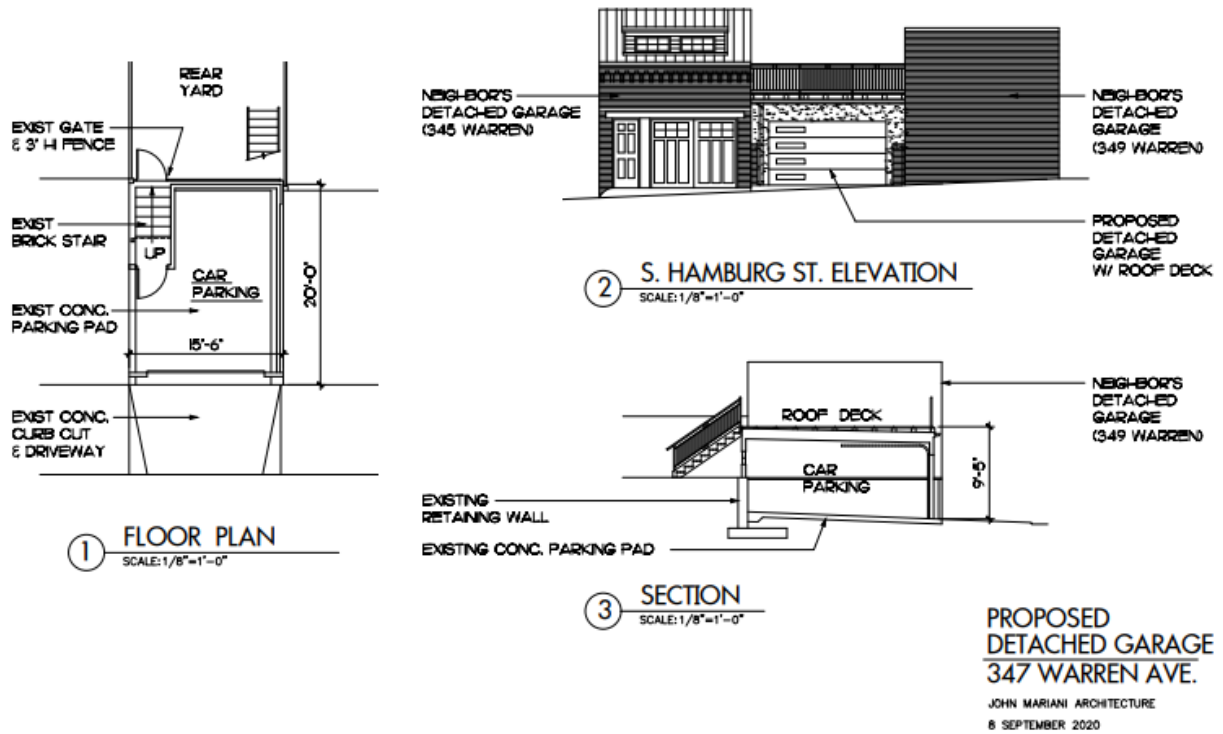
347 Warren Avenue – Proposed rear garage, floor plan, elevation, section
